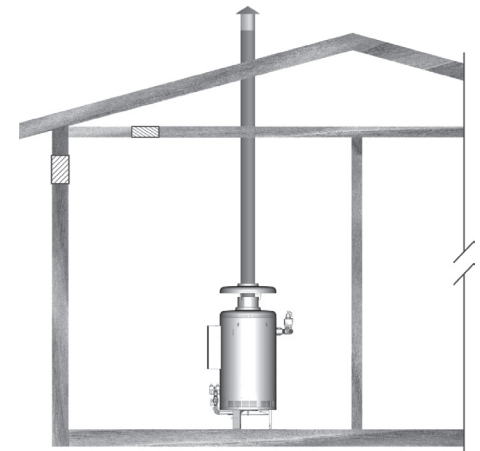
OUTDOOR AIR THROUGH ONE OPENING
